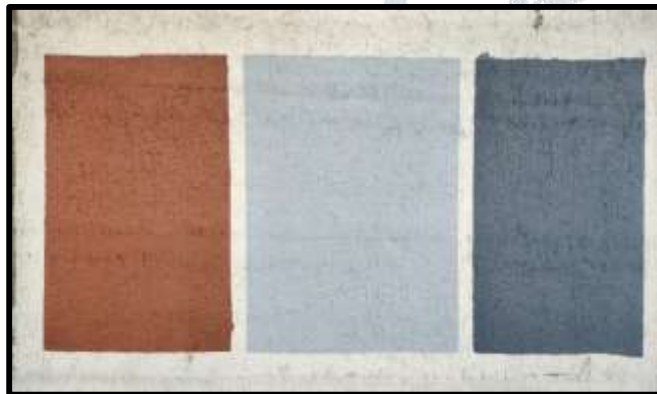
SAMPLING OF EXTERNAL WALL WATERPROOFING
